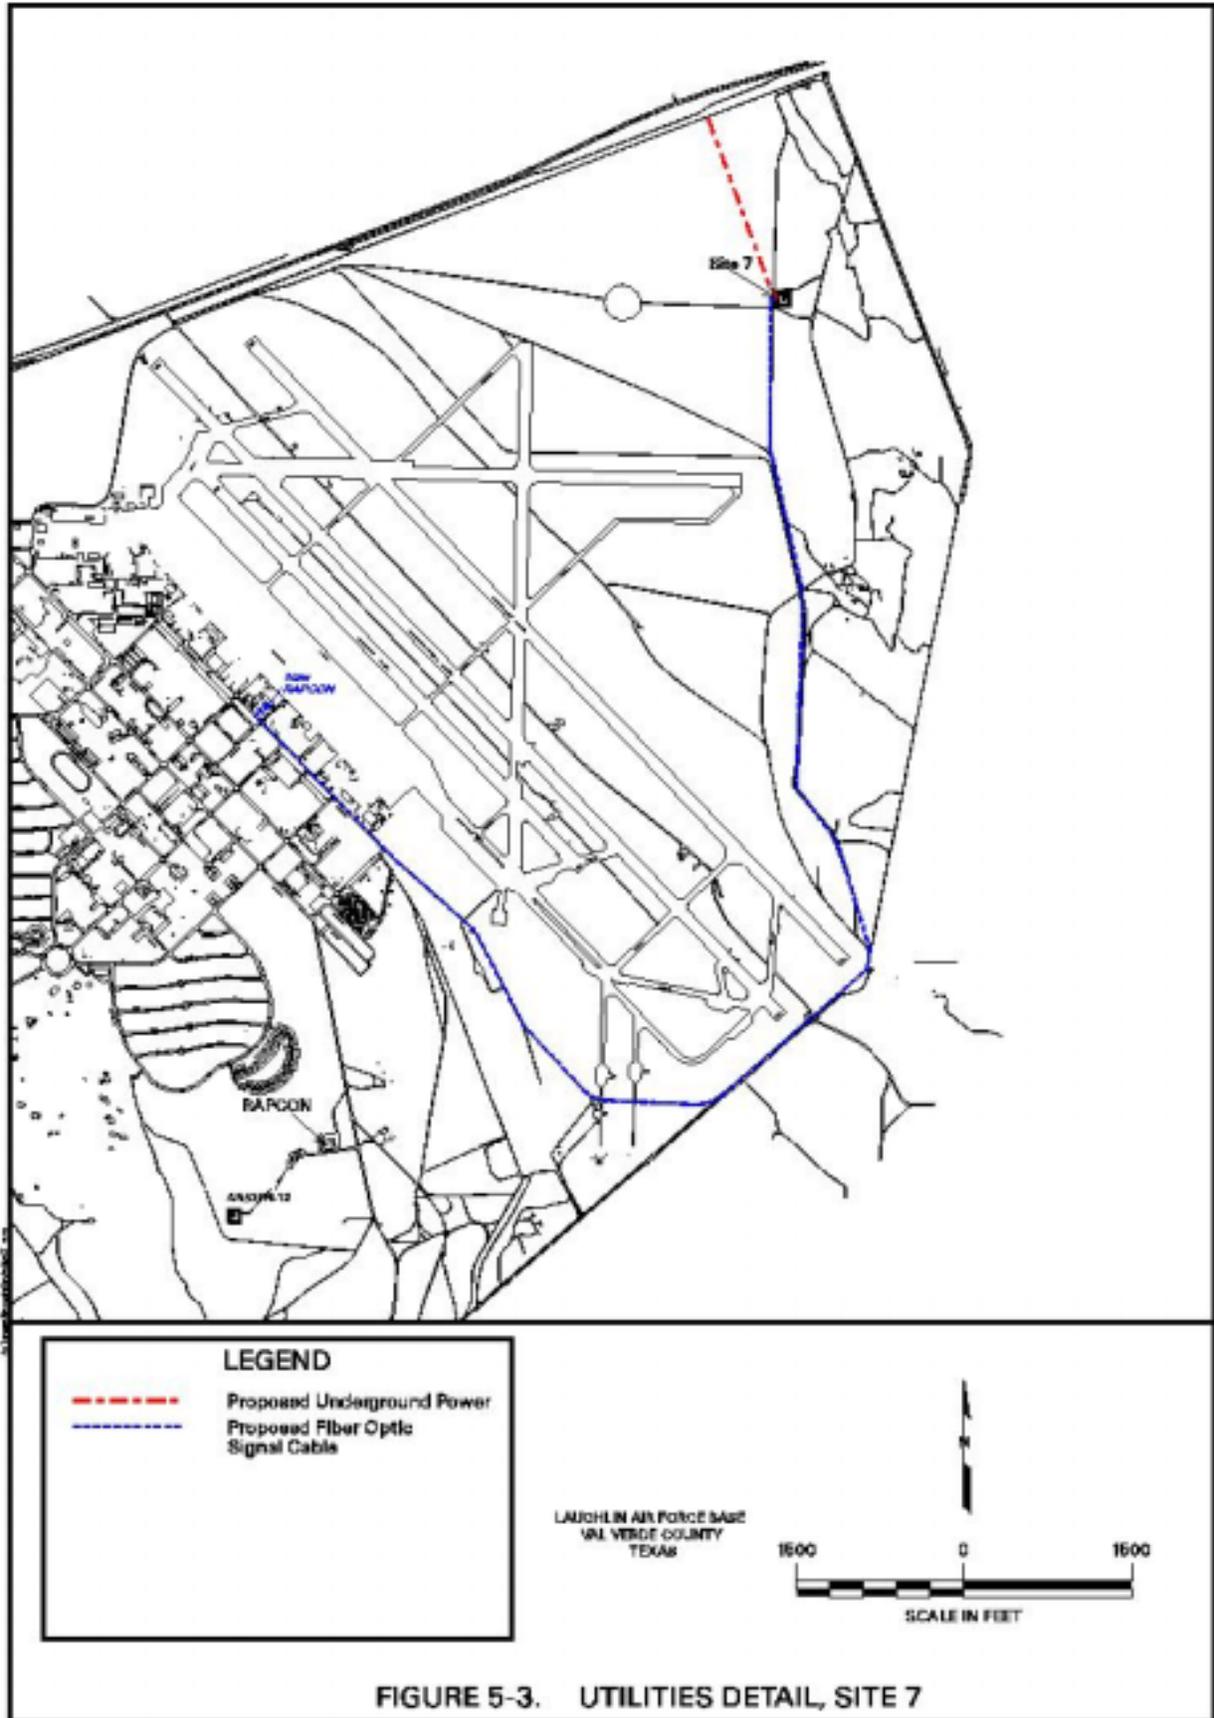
UTILITIES DETAIL, SITE 7
